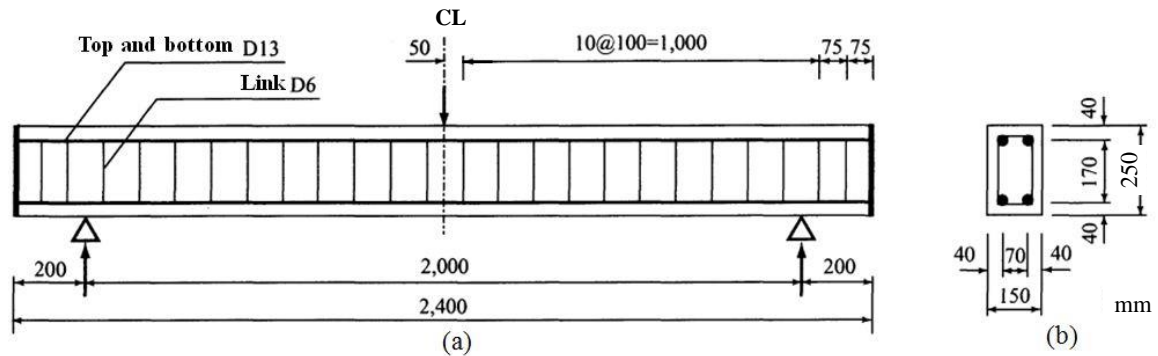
Rebar arrangement (a) side view (b) cross-sectional view
